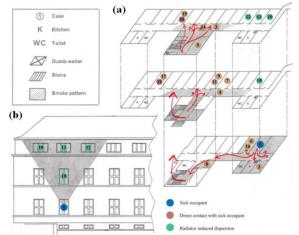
(a) The floor plan of the building where the airborne transmission occurred and the location of all cases. (b) building façade [37].
